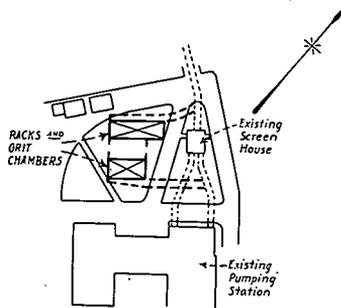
PRELIMINARY LAYOUT OF PROPOSED STRUCTURES AT CALF PASTURE
